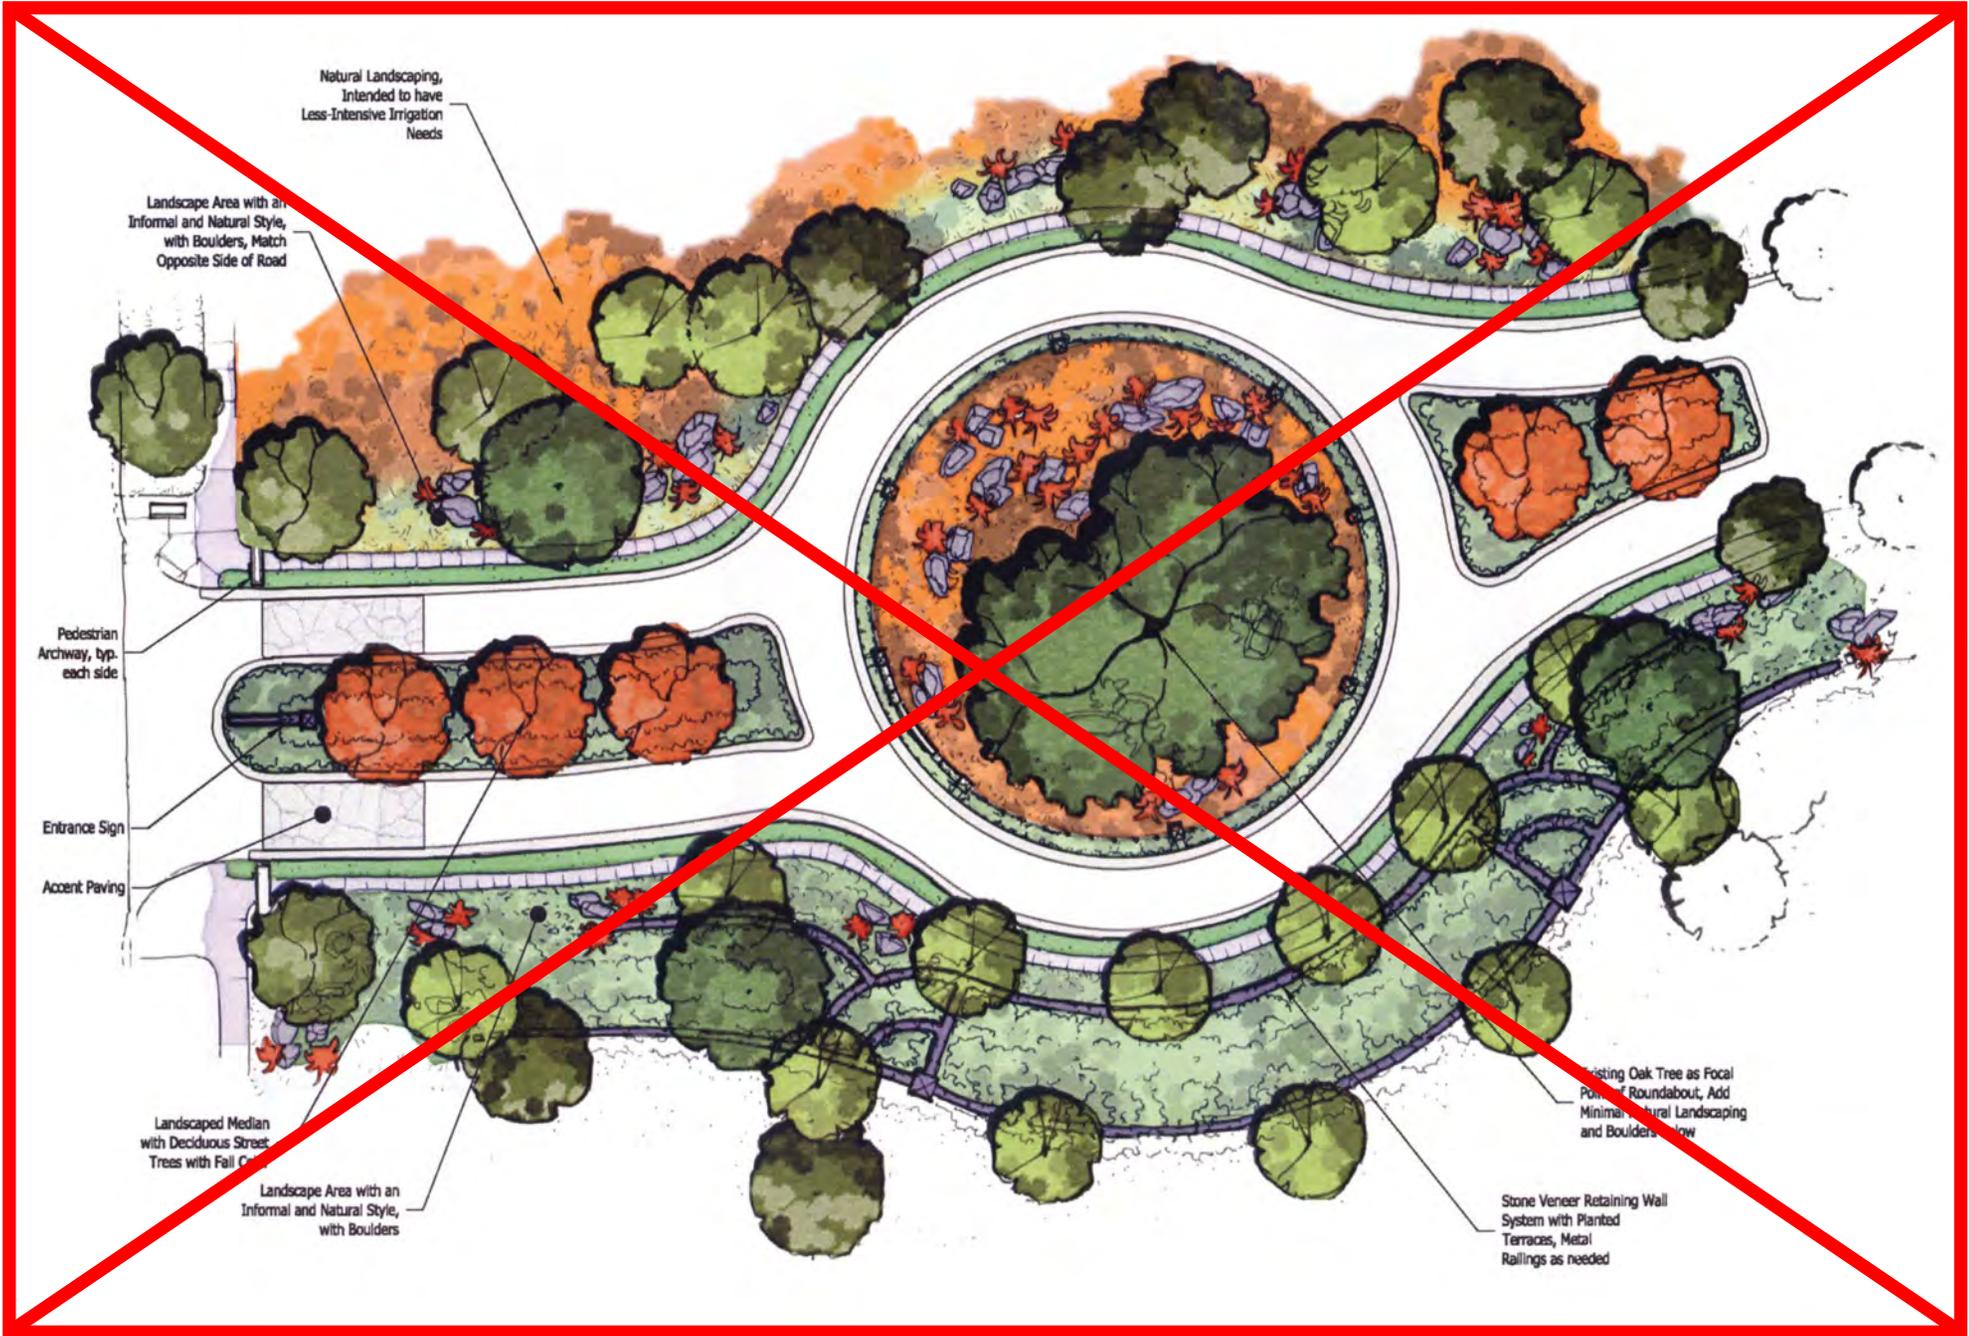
WALERGA GATEWAY CONCEPT
